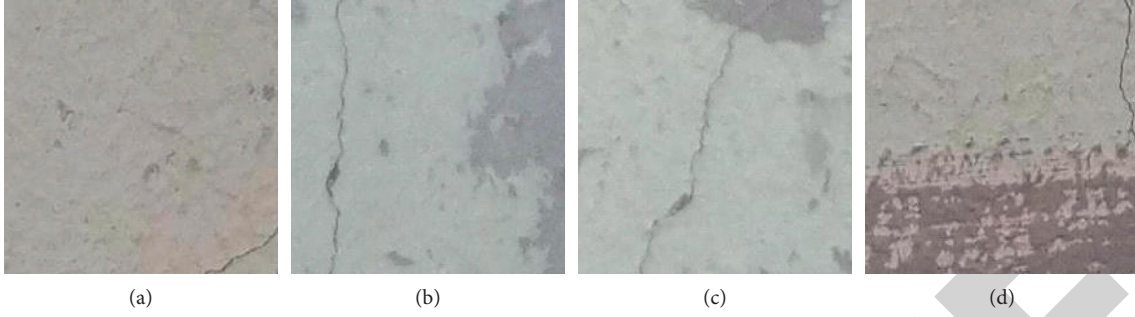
Sample cracks. (a) Short cracks at edges. (b) Central cracks. (c) Short cracks at corners. (d) Long cracks at edges.
